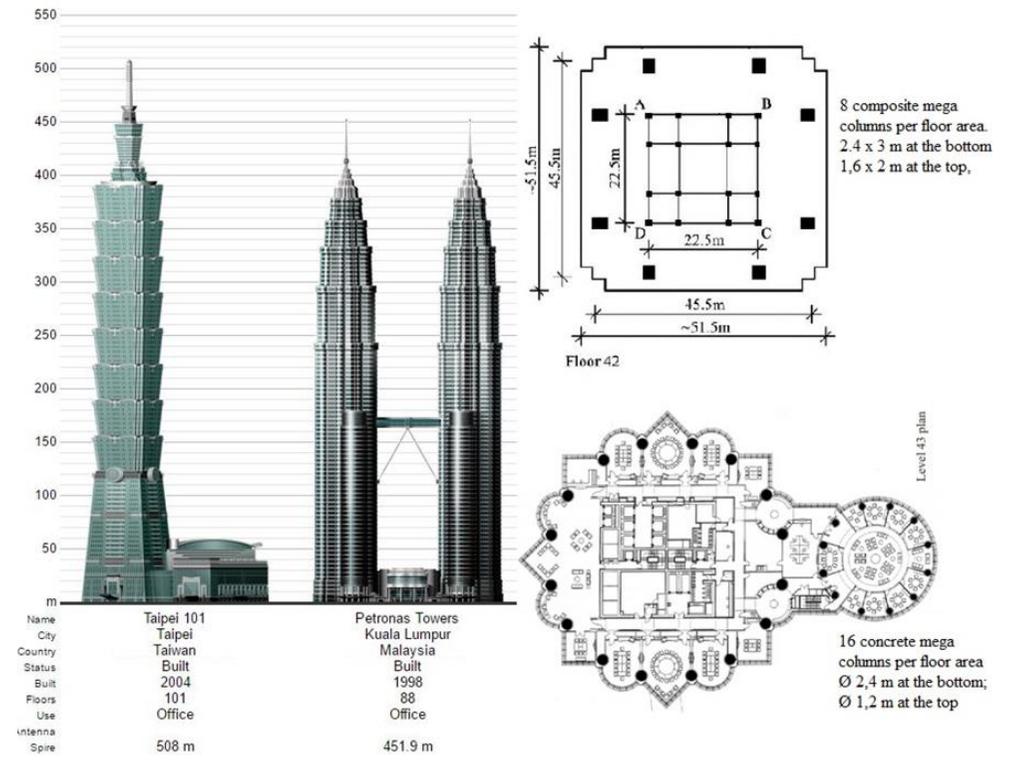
Taipei 101–Composite Structure Compared to the Petronas Towers–Reinforced Concrete Structure in Terms of Perimeter Columns [189, 14, 98]
